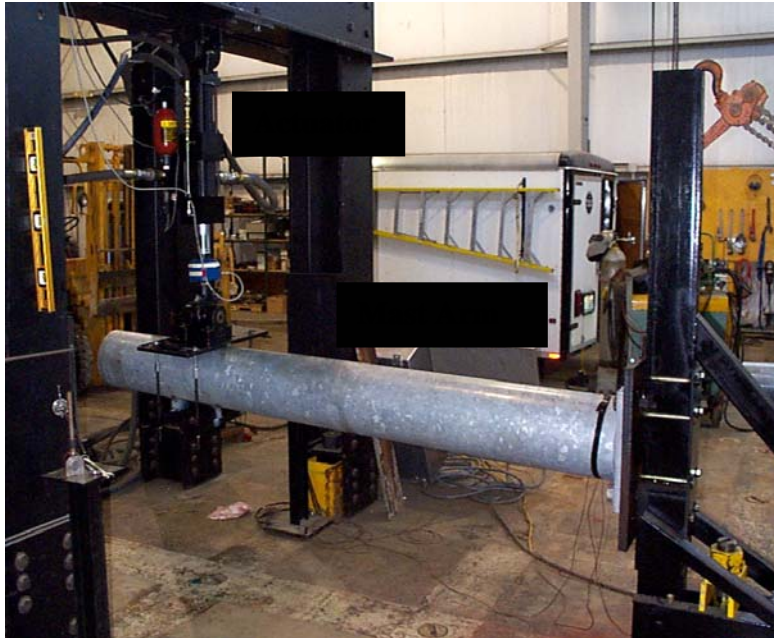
Test Set-Up for Fatigue Tests Valmont Mast Arm CB 12917
